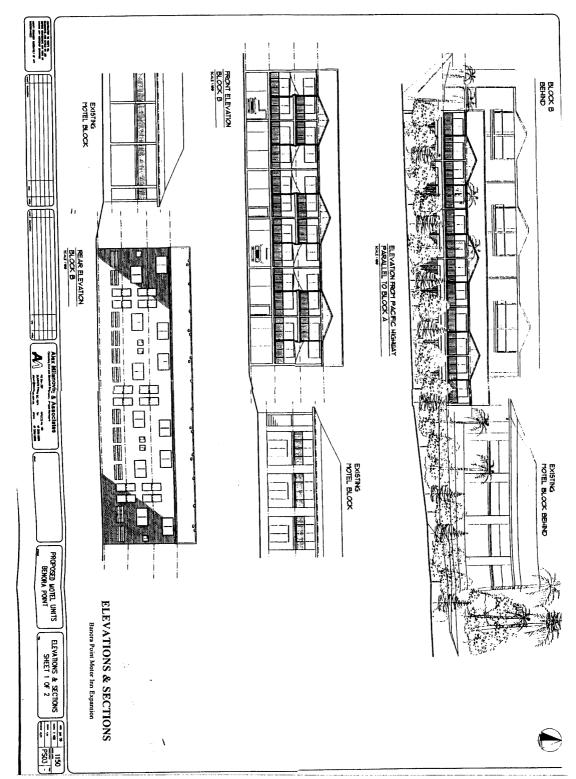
ELEVATIONS & CROSS SECTIONS
